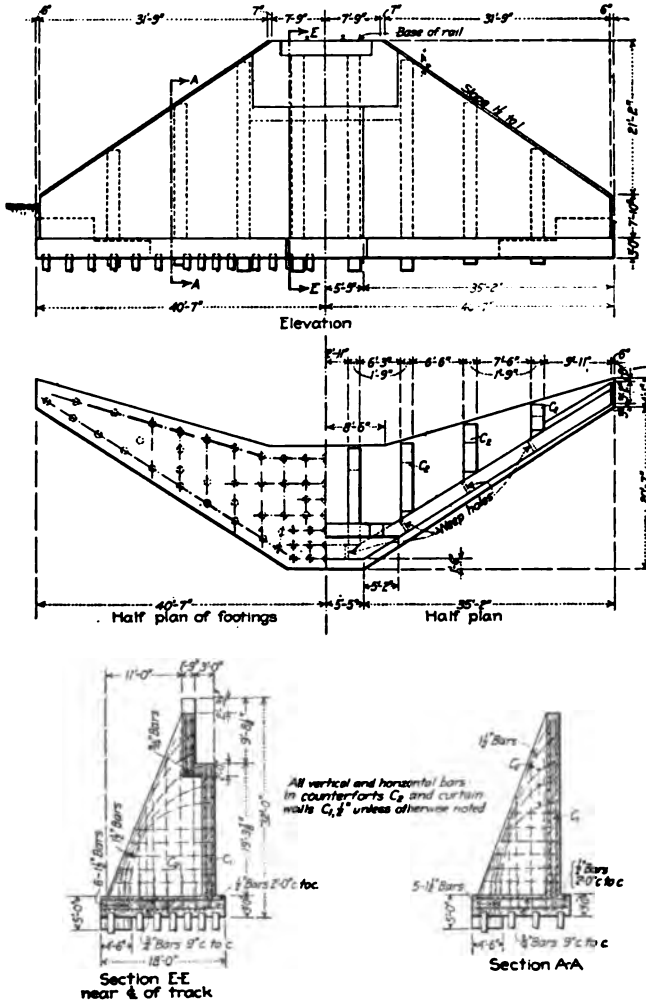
Reinforced-concrete counterfort wing abutment.
